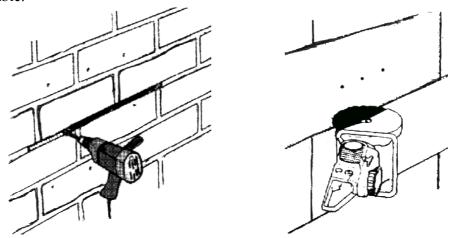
Methods of mortar removal: stitch drilling and saw cutting.
